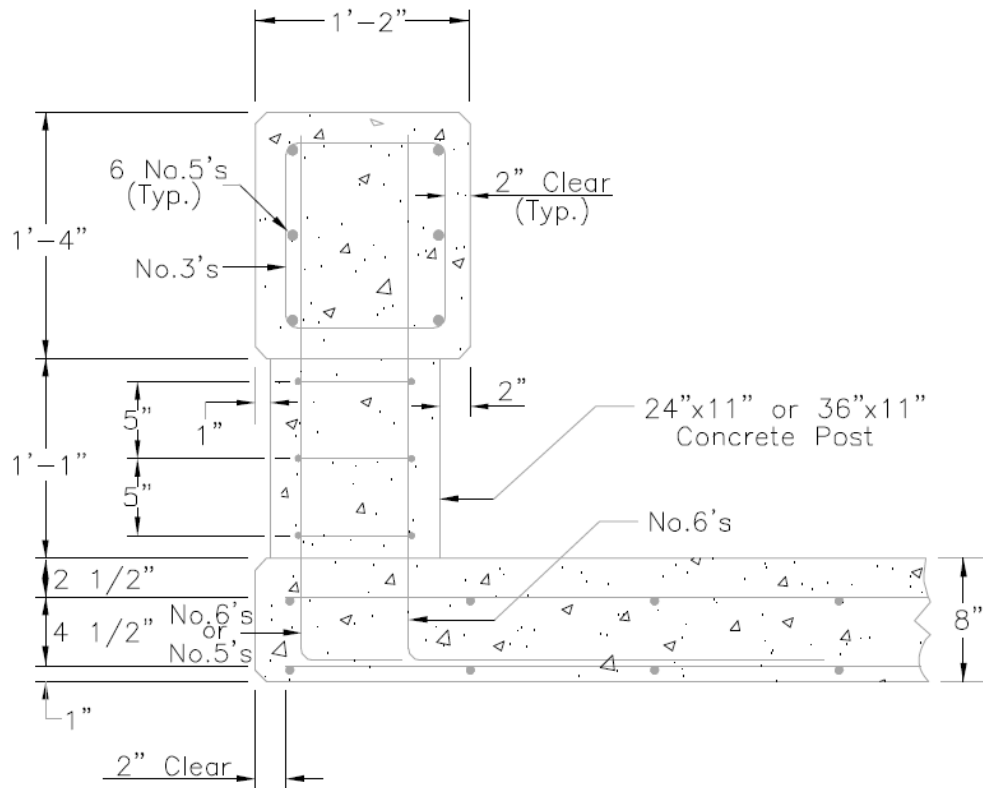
Nebraska Open Concrete Rail Drawing [22]
